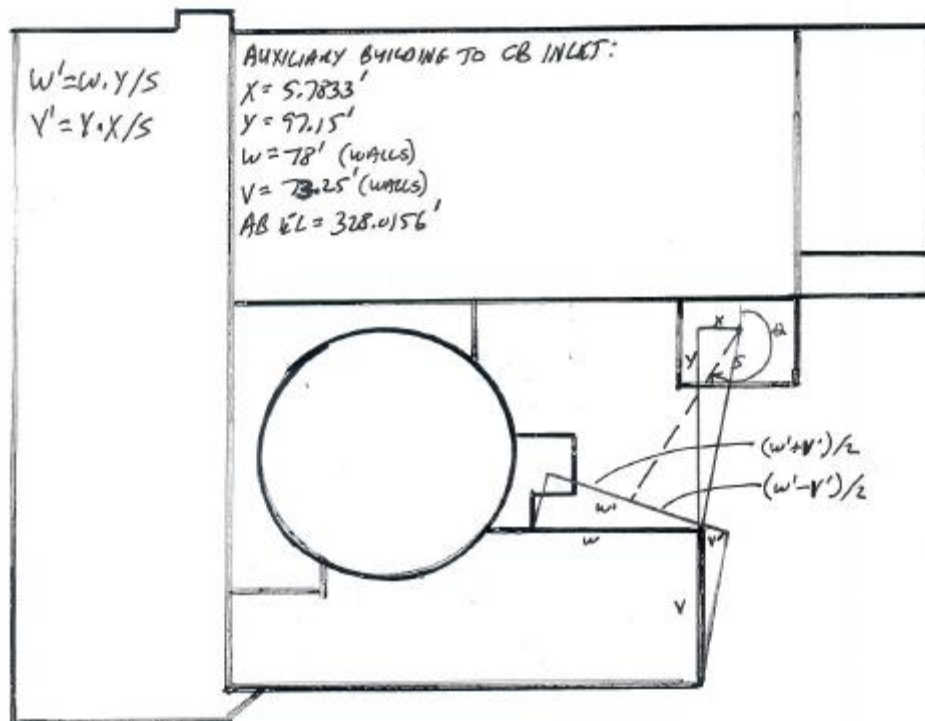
Auxiliary Building Walls (Area Source) to Control Room Inlet
